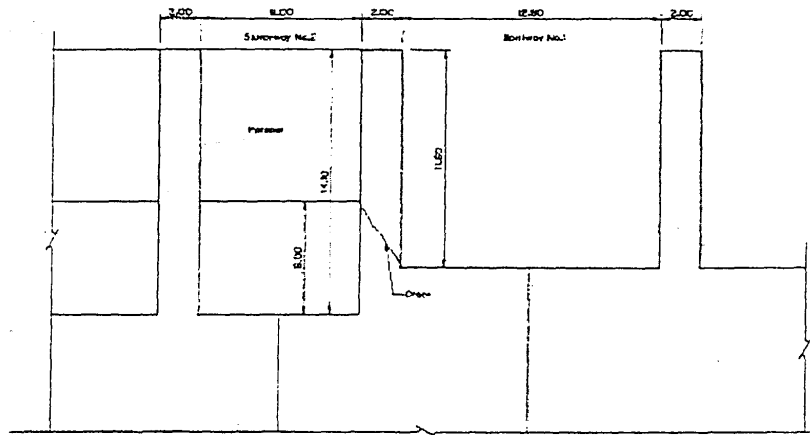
The Damage Behavior of the Pier between Spillway No.1 and Sluiceway No.2
